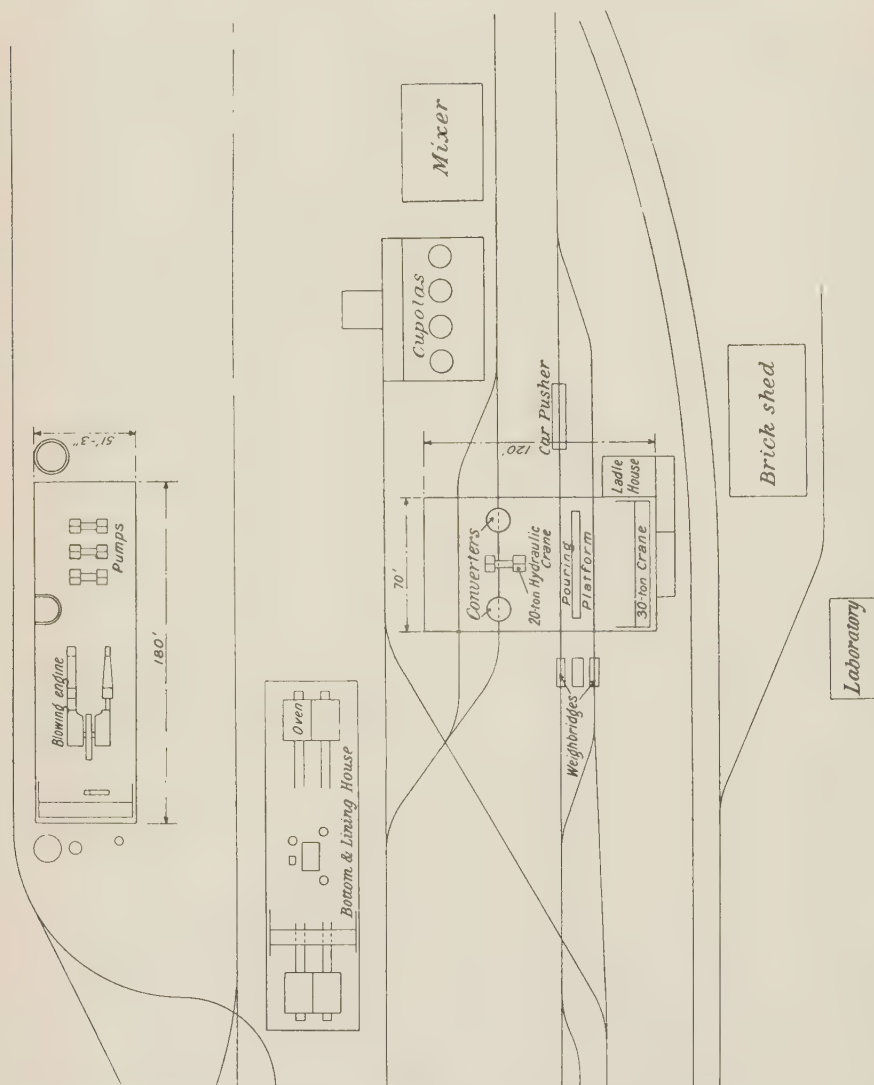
Plan of the Youngstown Sheet and Tube Co.'s Steel Works, Youngstown, U.S.A.
